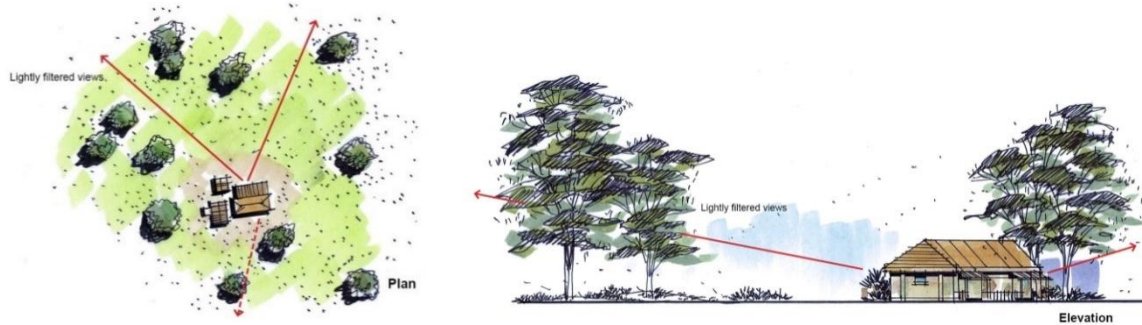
Typology 1 – Minimally screened. Typical plan and elevation.
